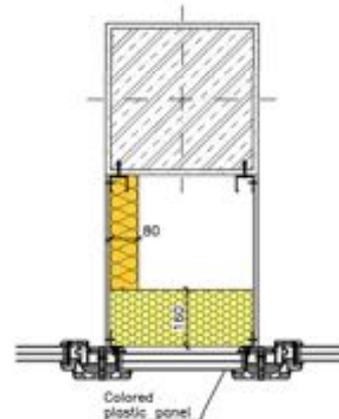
Detail of installation of plastic panel in front of the load-bearing reinforced concrete column. EPS thermal insulation (beige) is installed from the interior side. Acoustic insulation made of mineral wool (orange) is also visible.
